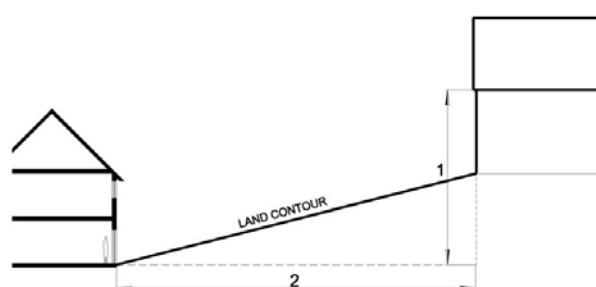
The distance between habitable room windows and an elevated blank wall must be minimum 2 times of the height of the wall plus the level difference.
